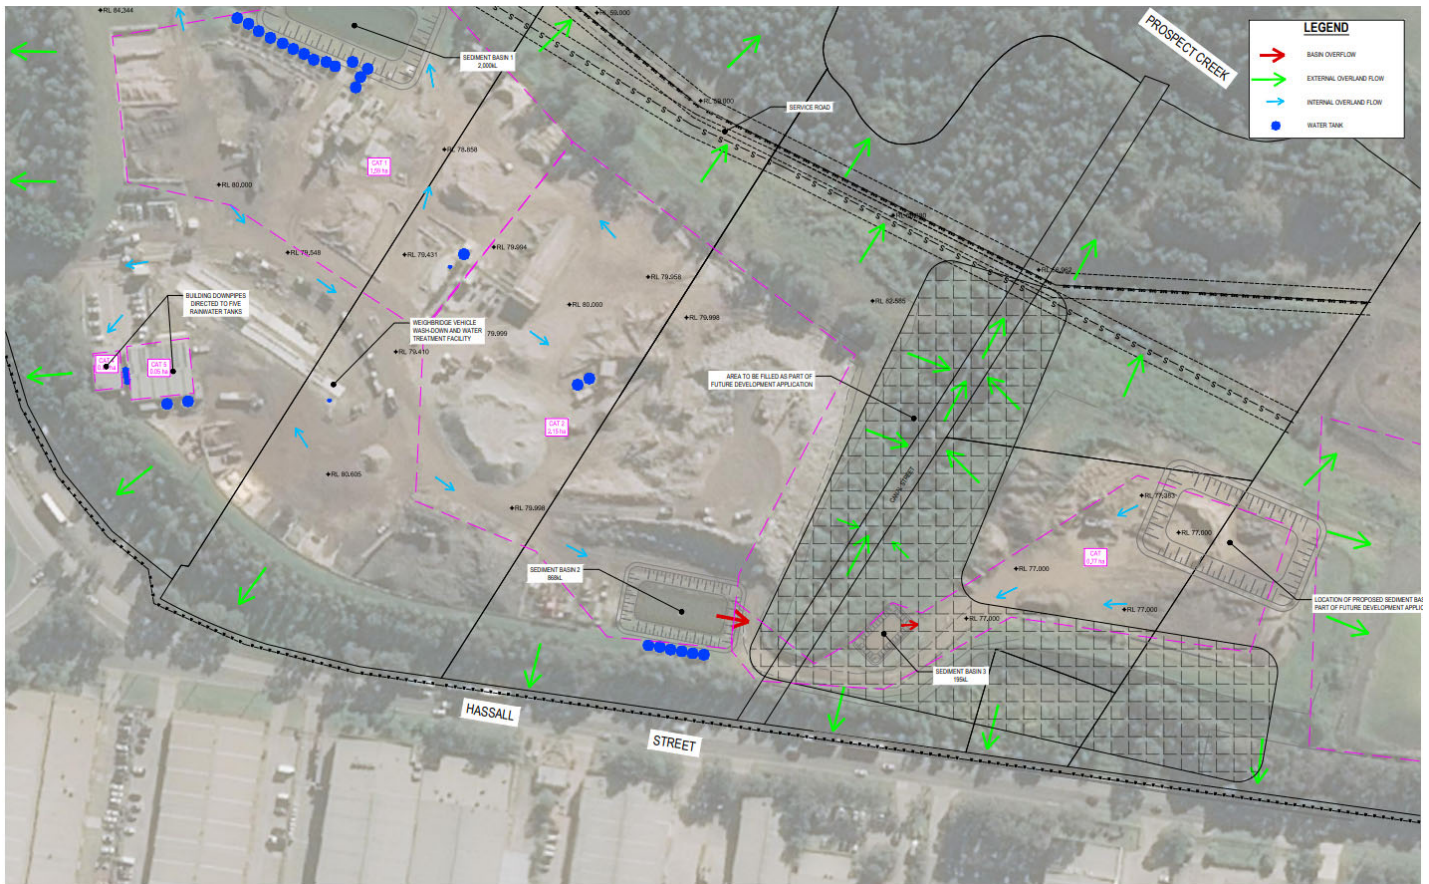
Stormwater Drainage – Note: no stormwater drains located on site
